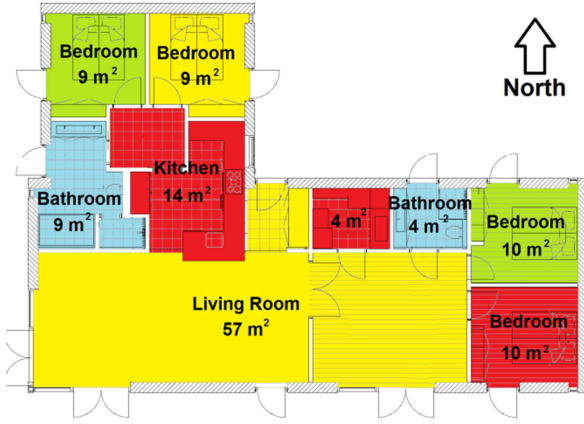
Scheme of the house case study: a typical 150 m² single family house in Denmark.
